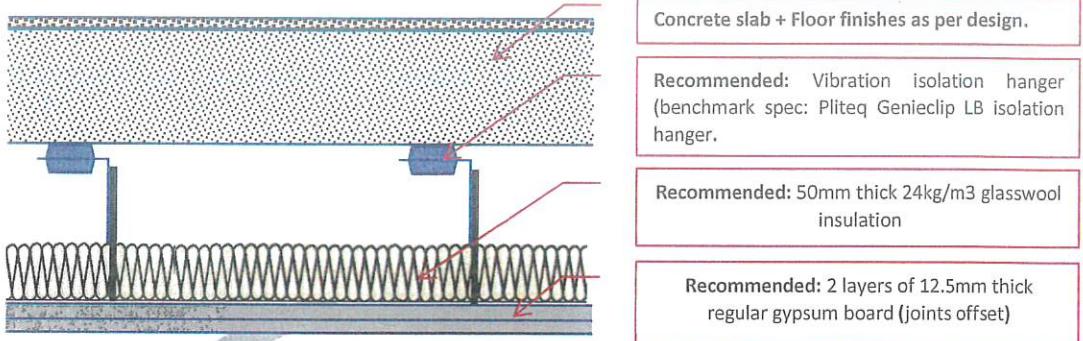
SECTION ELEVATION – RESILIENT SUSPENDED CEILING RECOMMENDATION (NTS)
